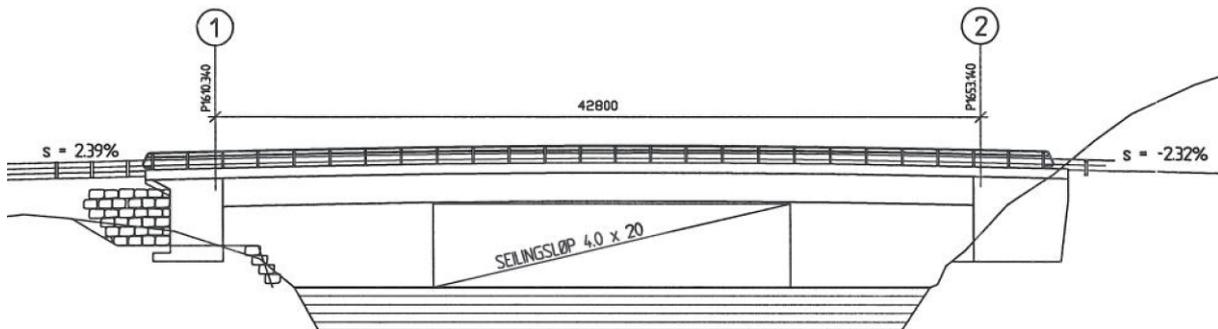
Klenevågen Steel Box Girder Bridge has a bridge span of 42,8 m.
